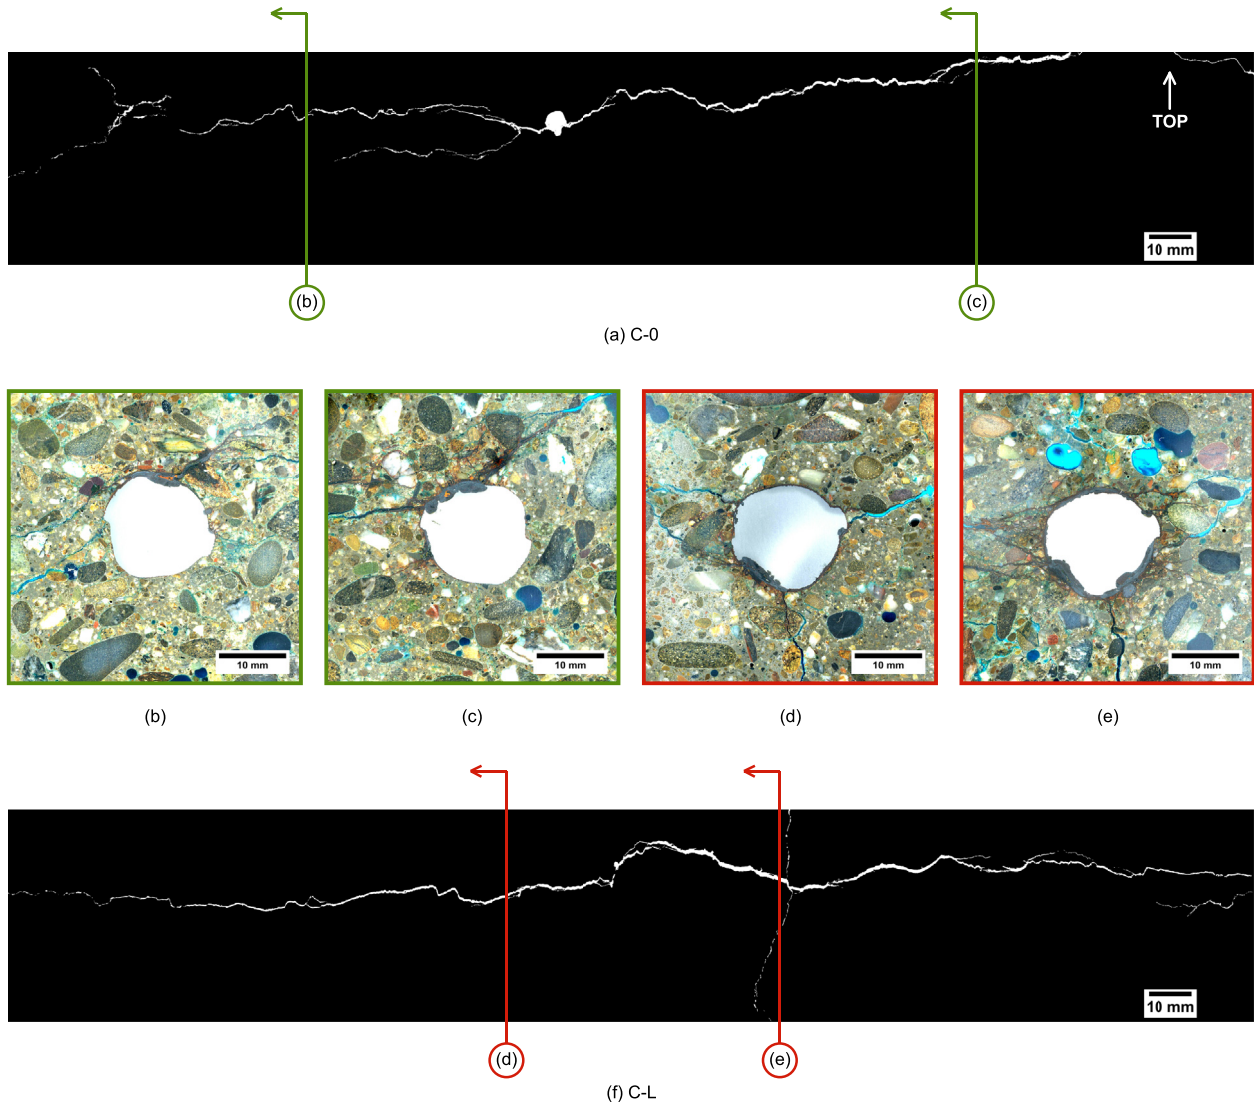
Sectional images of reinforced concrete specimens at the conclusion of environmental conditioning: (a)–(c) C-0; (d)–(f) C-L. Colored vertical lines on binary images indicate locations of indicated transverse section cuts. Binary images are used to highlight crack locations on a vertical surface of the extracted prism (as in Fig. 5). A blue-colored epoxy was used to impregnate cracks and voids in transverse section views. (For interpretation of the references to color in this figure caption, the reader is referred to the Web version of this article.)
